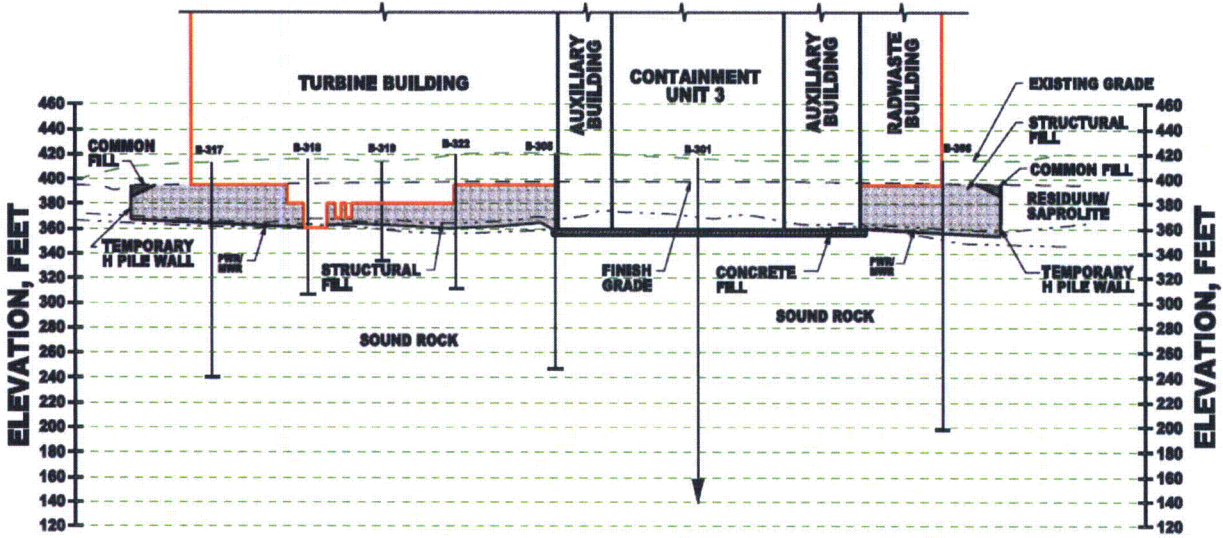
Cross-Section of Structure Foundation C-C
